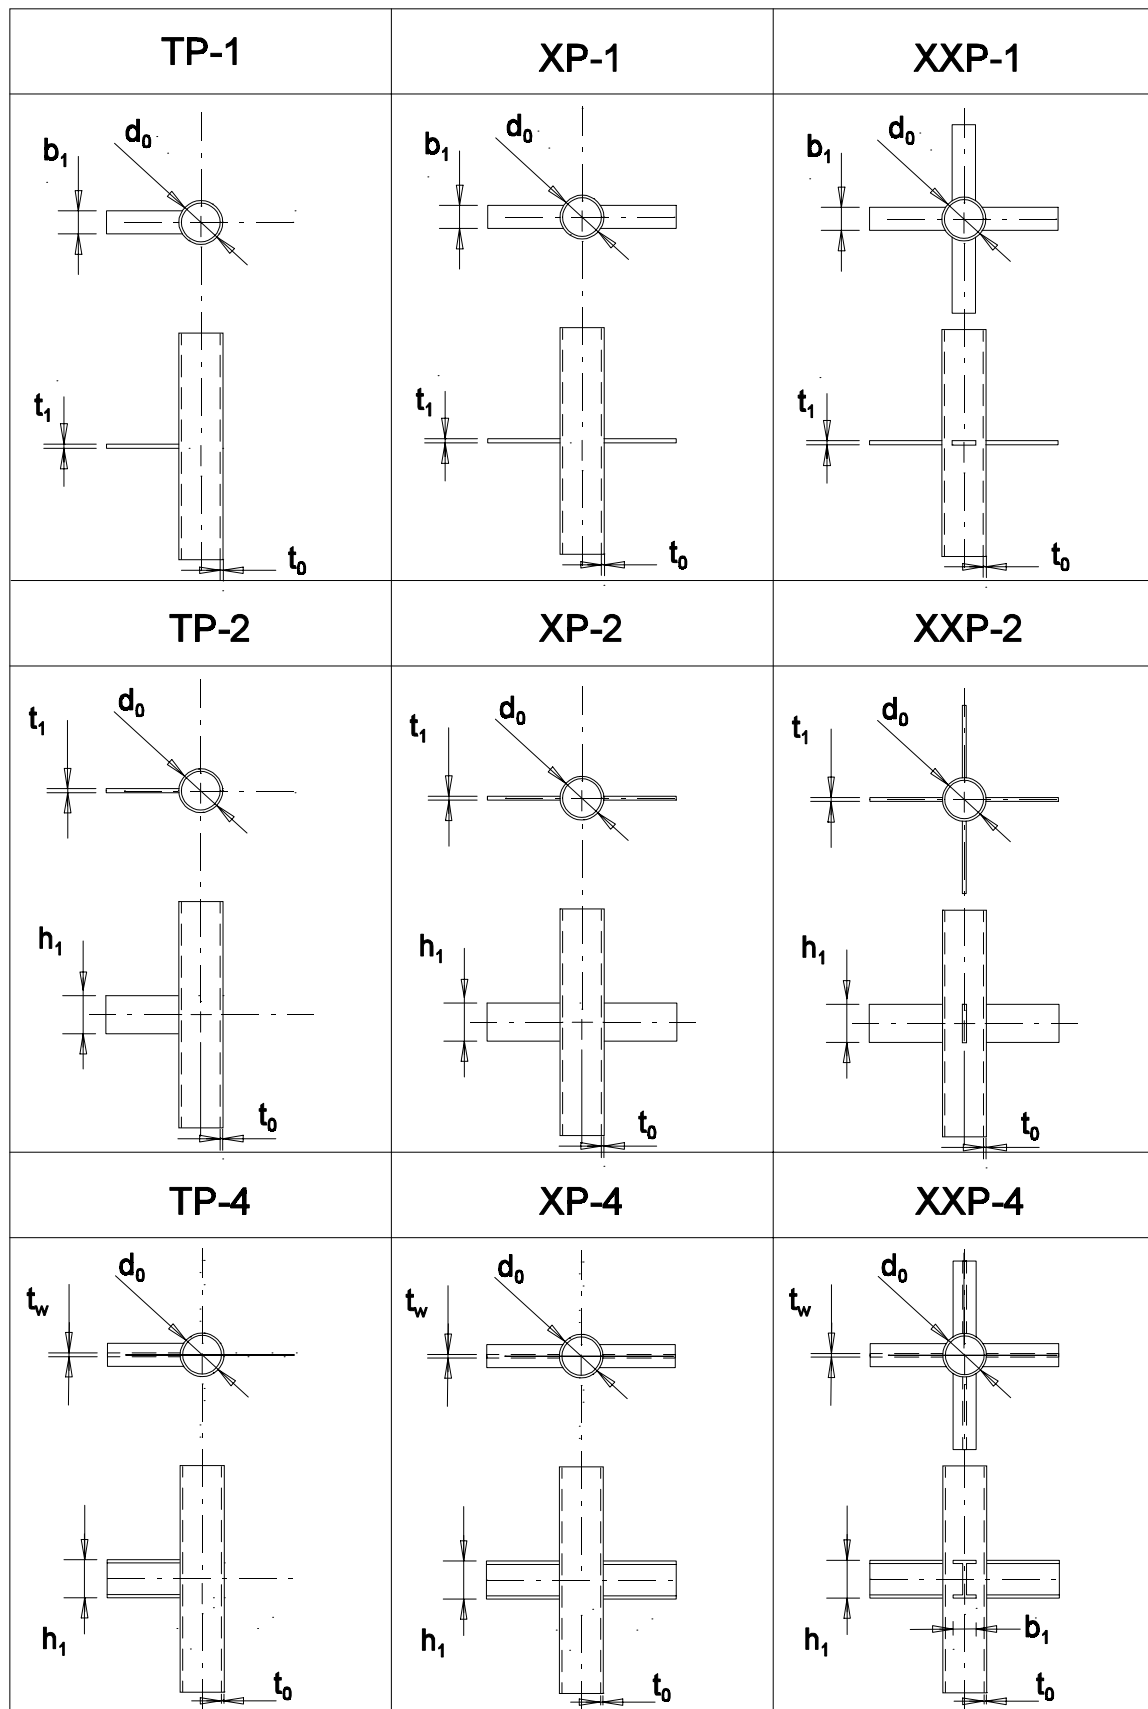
Overview welded plate and I-beam to CHS column connections
